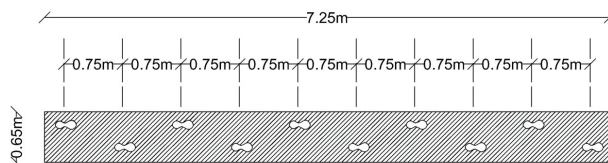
Plan showing the dimensions of the floor needed for ten steps
